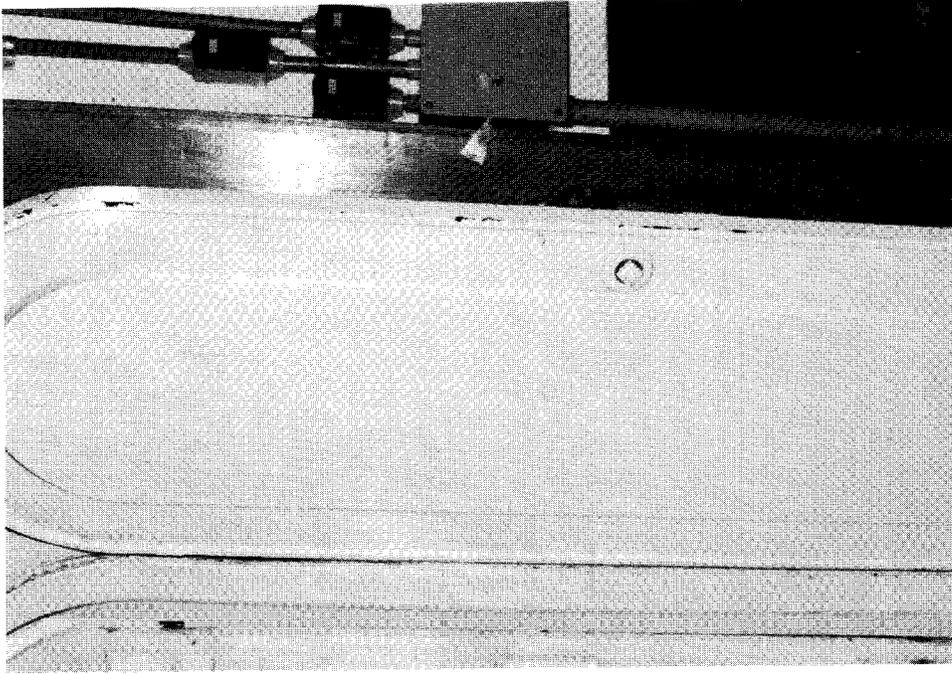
Room 112, middle door in exterior doorway from Watch Deck to Watch Gallery.
